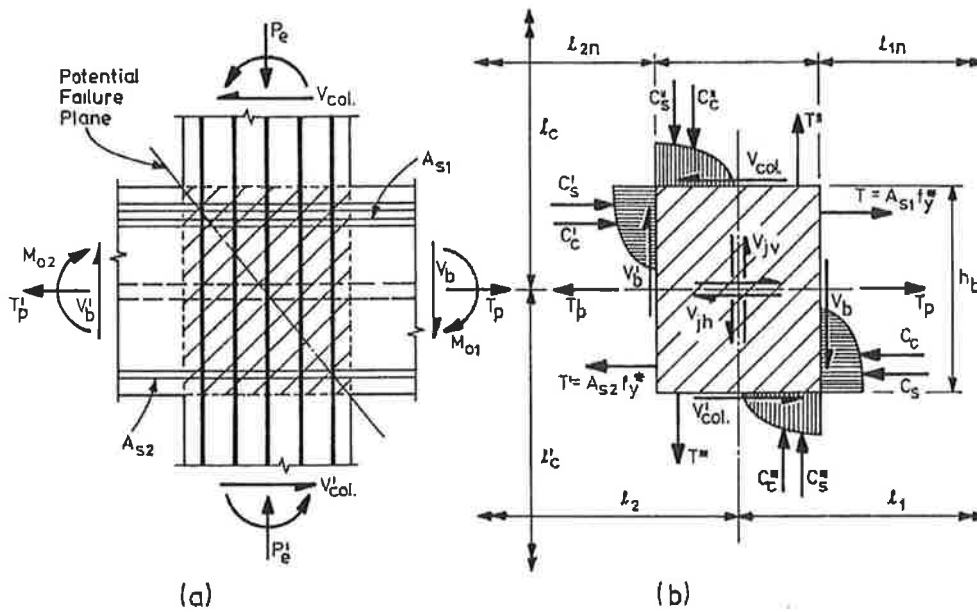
EXTERNAL ACTIONS AND INTERNAL FORCES OF A TYPICAL INTERIOR BEAM-COLUMN JOINT
